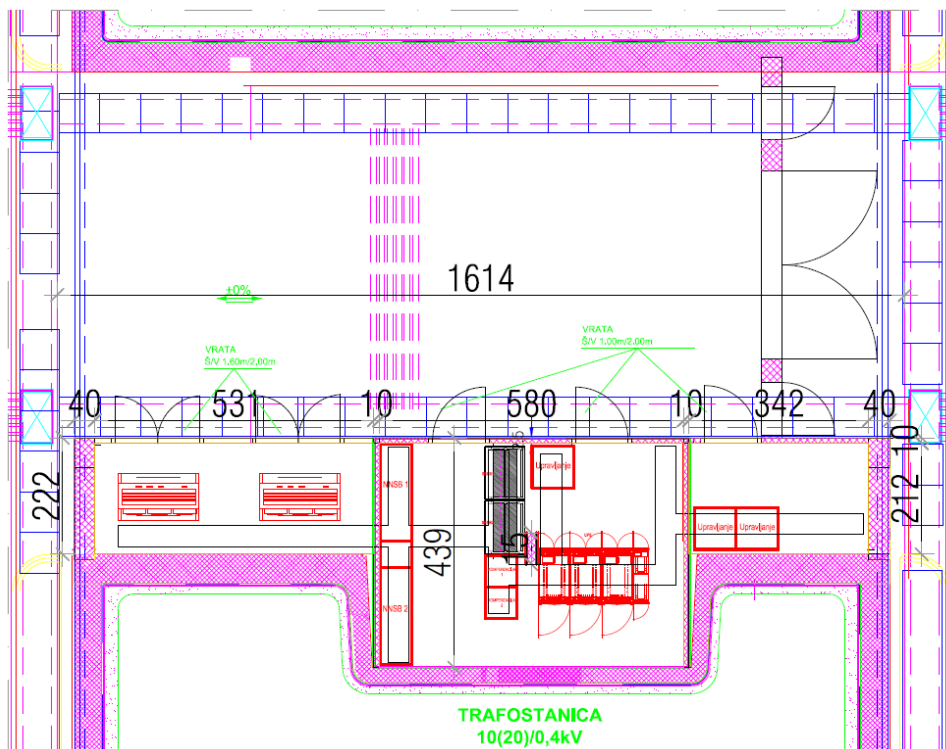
Tunnel Transformer Substation – Equipment Layout
